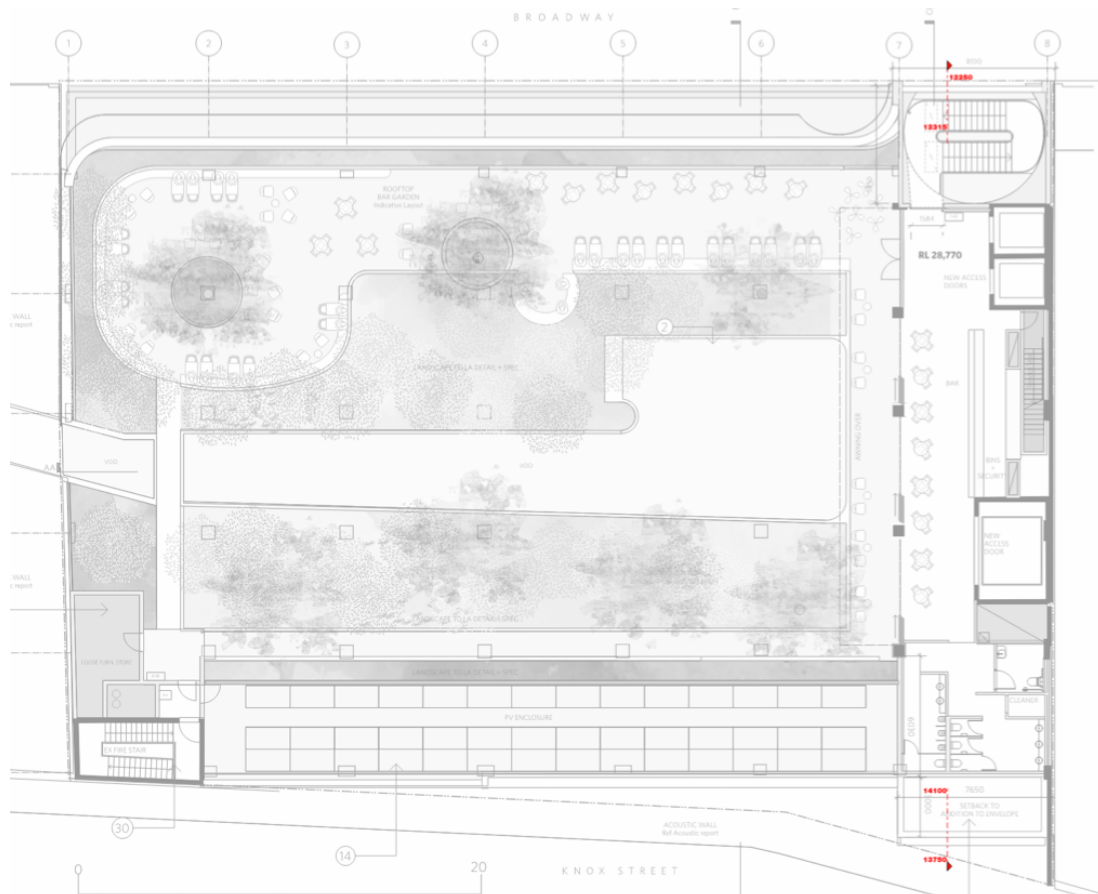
Site plan showing where Section is cut and relevant RLs at footpaths of Broadway and Knox St (DBJ – updated by Tricon)
